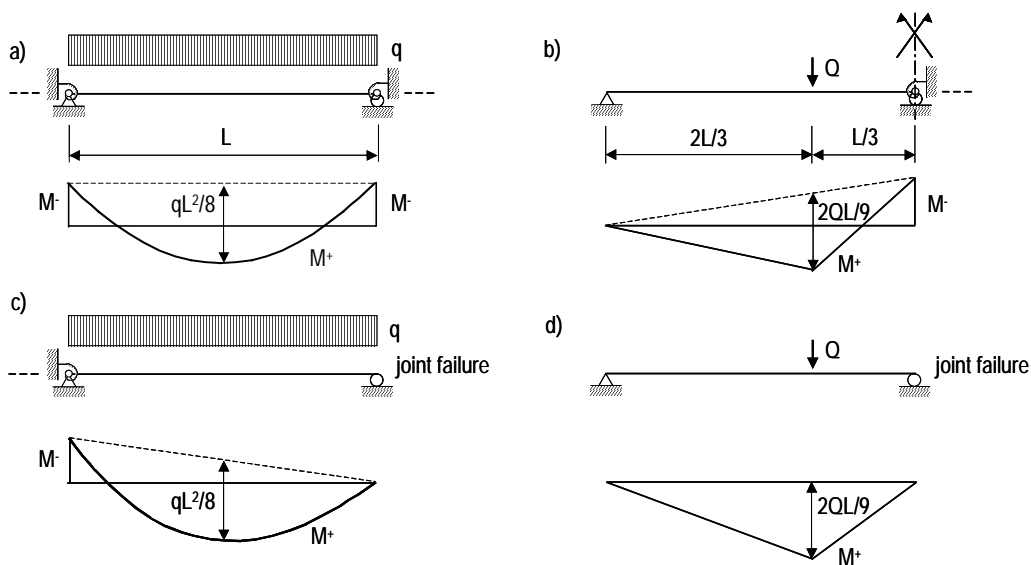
Multi-span beam or two-span beam with semi-rigid connection at mid-support before (a-b) and after (c-d) joint failure at the right connection
